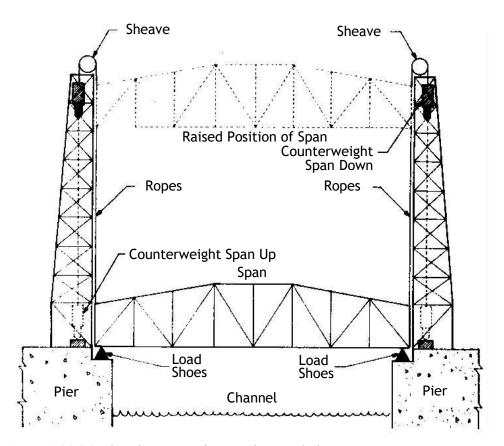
Closed Span Resting on Live Load Shoes
